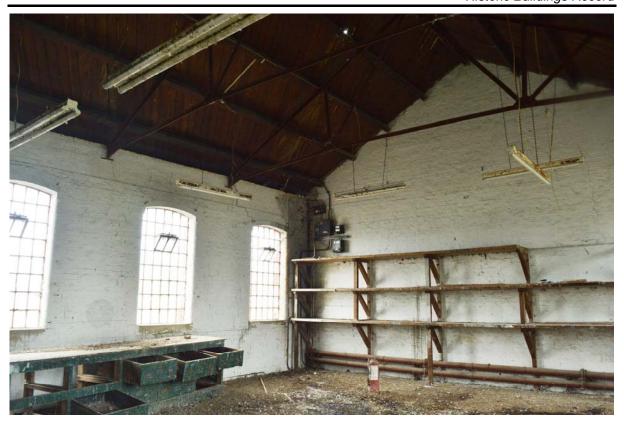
Equipment store (Building 31), first floor, looking north-east (SGA15-205)
